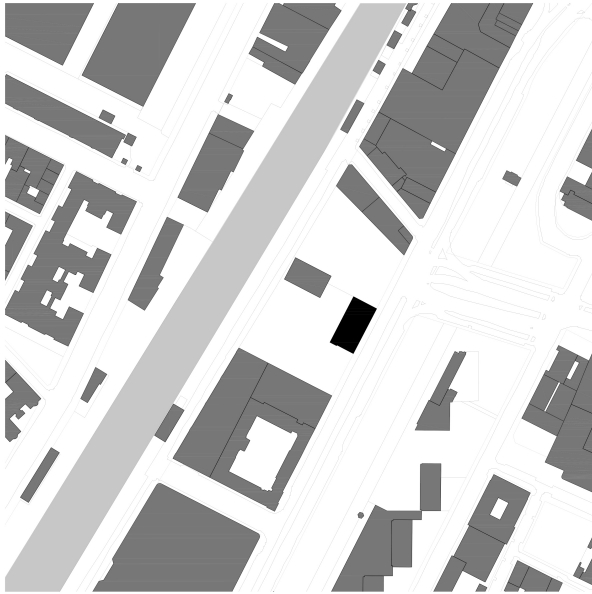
Site plan and dwelling type of the project on the former site of the BPost building, Brussels (2019).
